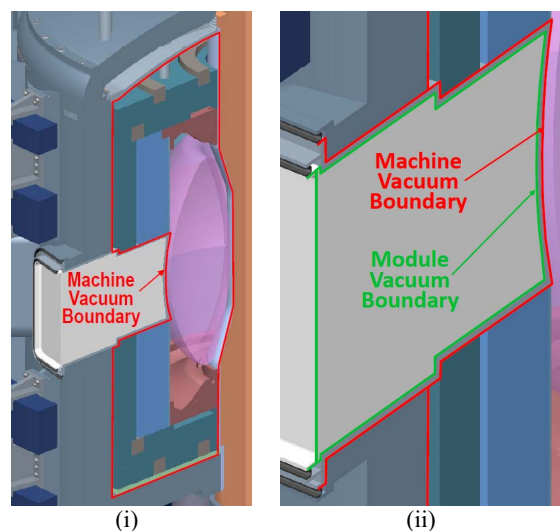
Vacuum boundary and weld seals concepts for (i) FNSF chamber, and (ii) mid-plane test module.
